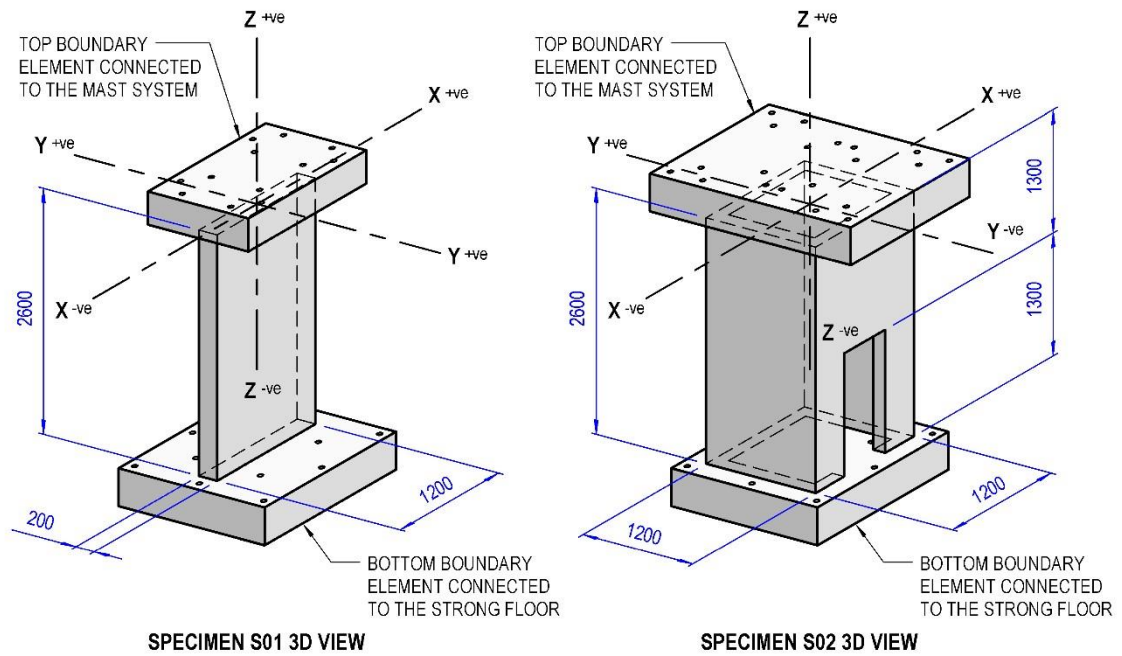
Rectangular wall and building core specimens (cast in-situ monolithic specimens)
